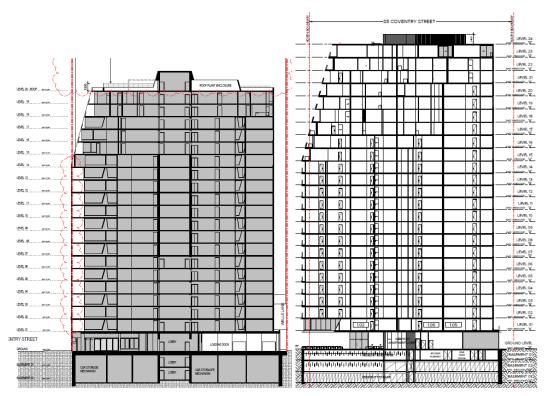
Endorsed (left) and proposed (right) North-South Section. From Drawings TP06.11 & TP-401
